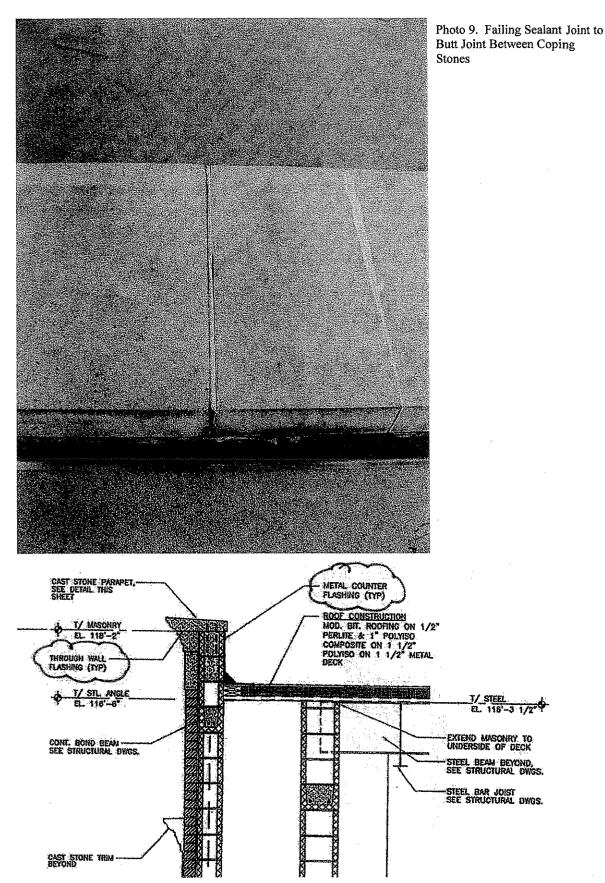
Wall Section from Construction Documents Showing Through Wall Flashing to be Installed
